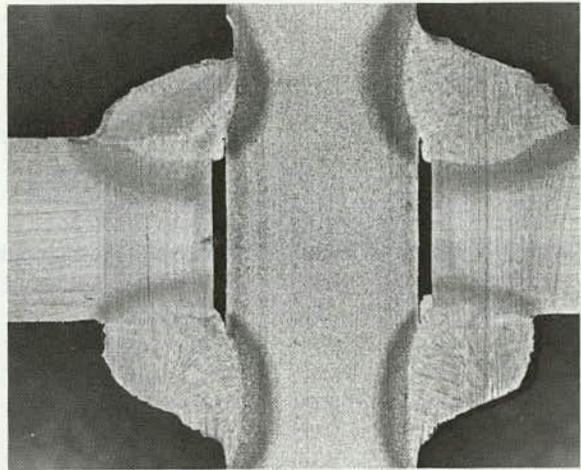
Gusset-stiffener connection adjacent to cope—beam 13 ($S_r = 13$ ksi), detail 1-cut.
